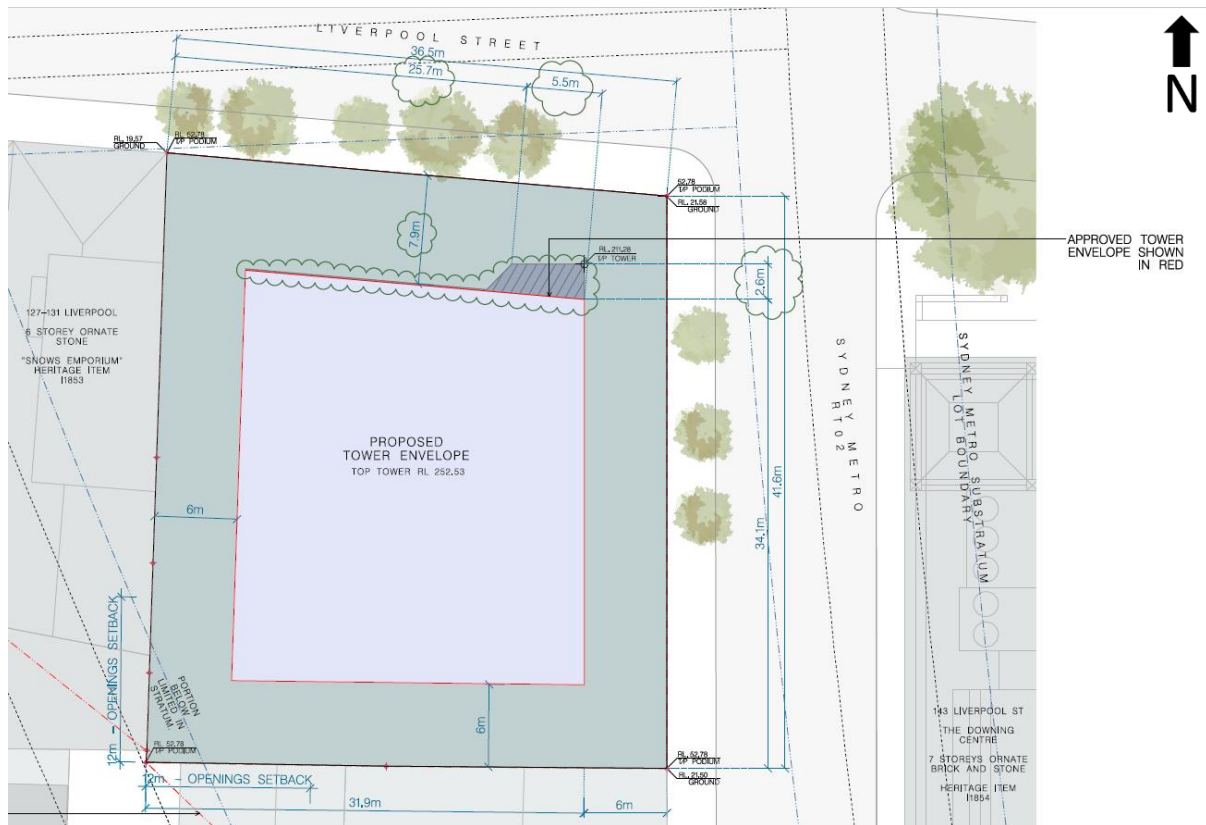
Proposed building envelope plan. Proposed areas of modification identified as hatched and clouded
